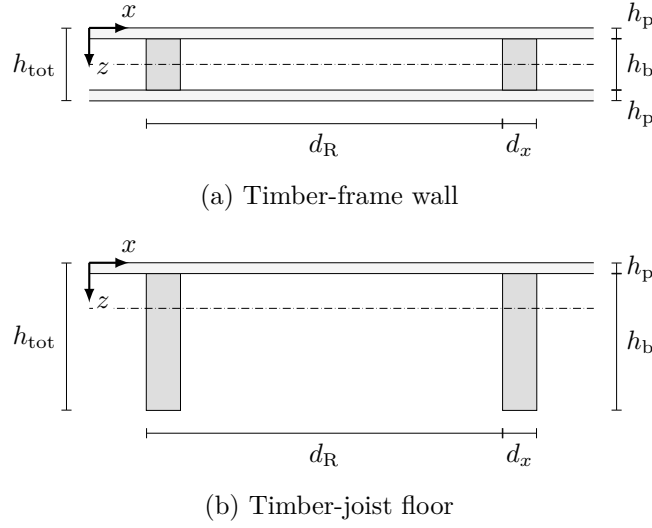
Cross section of the timber-frame wall and the timber-joist floor that shows the notation applied for the equivalent orthotropic plate model.
